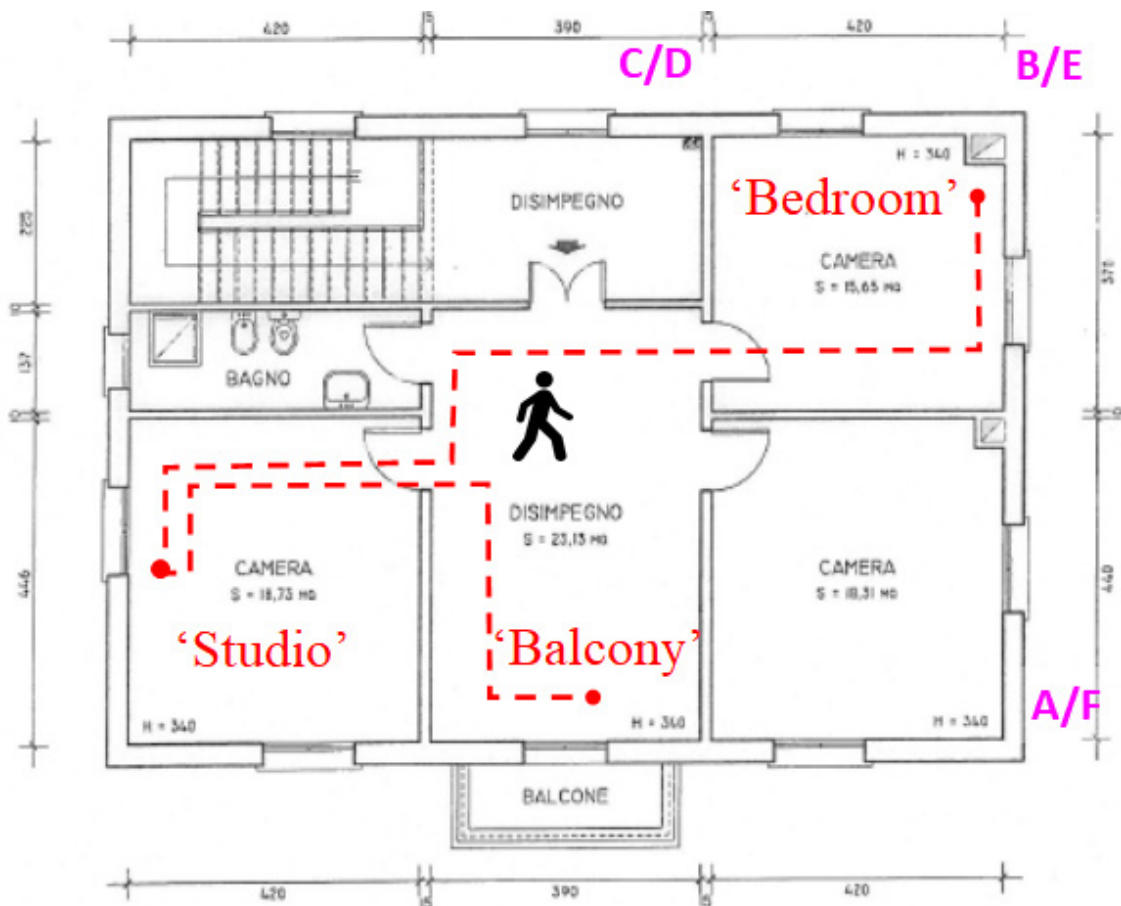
House plan, second floor – including route and 1<sup>st</sup> floor checkpoints
